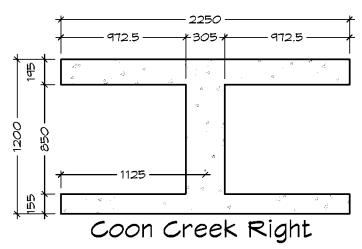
Modeled cross-section for Coon Creek Right bridge (smallest box section; dimensions in mm)
